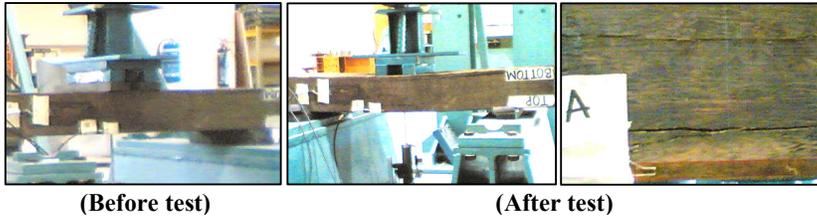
Crack Patterns for TRSN1- Longitudinal Crack.
